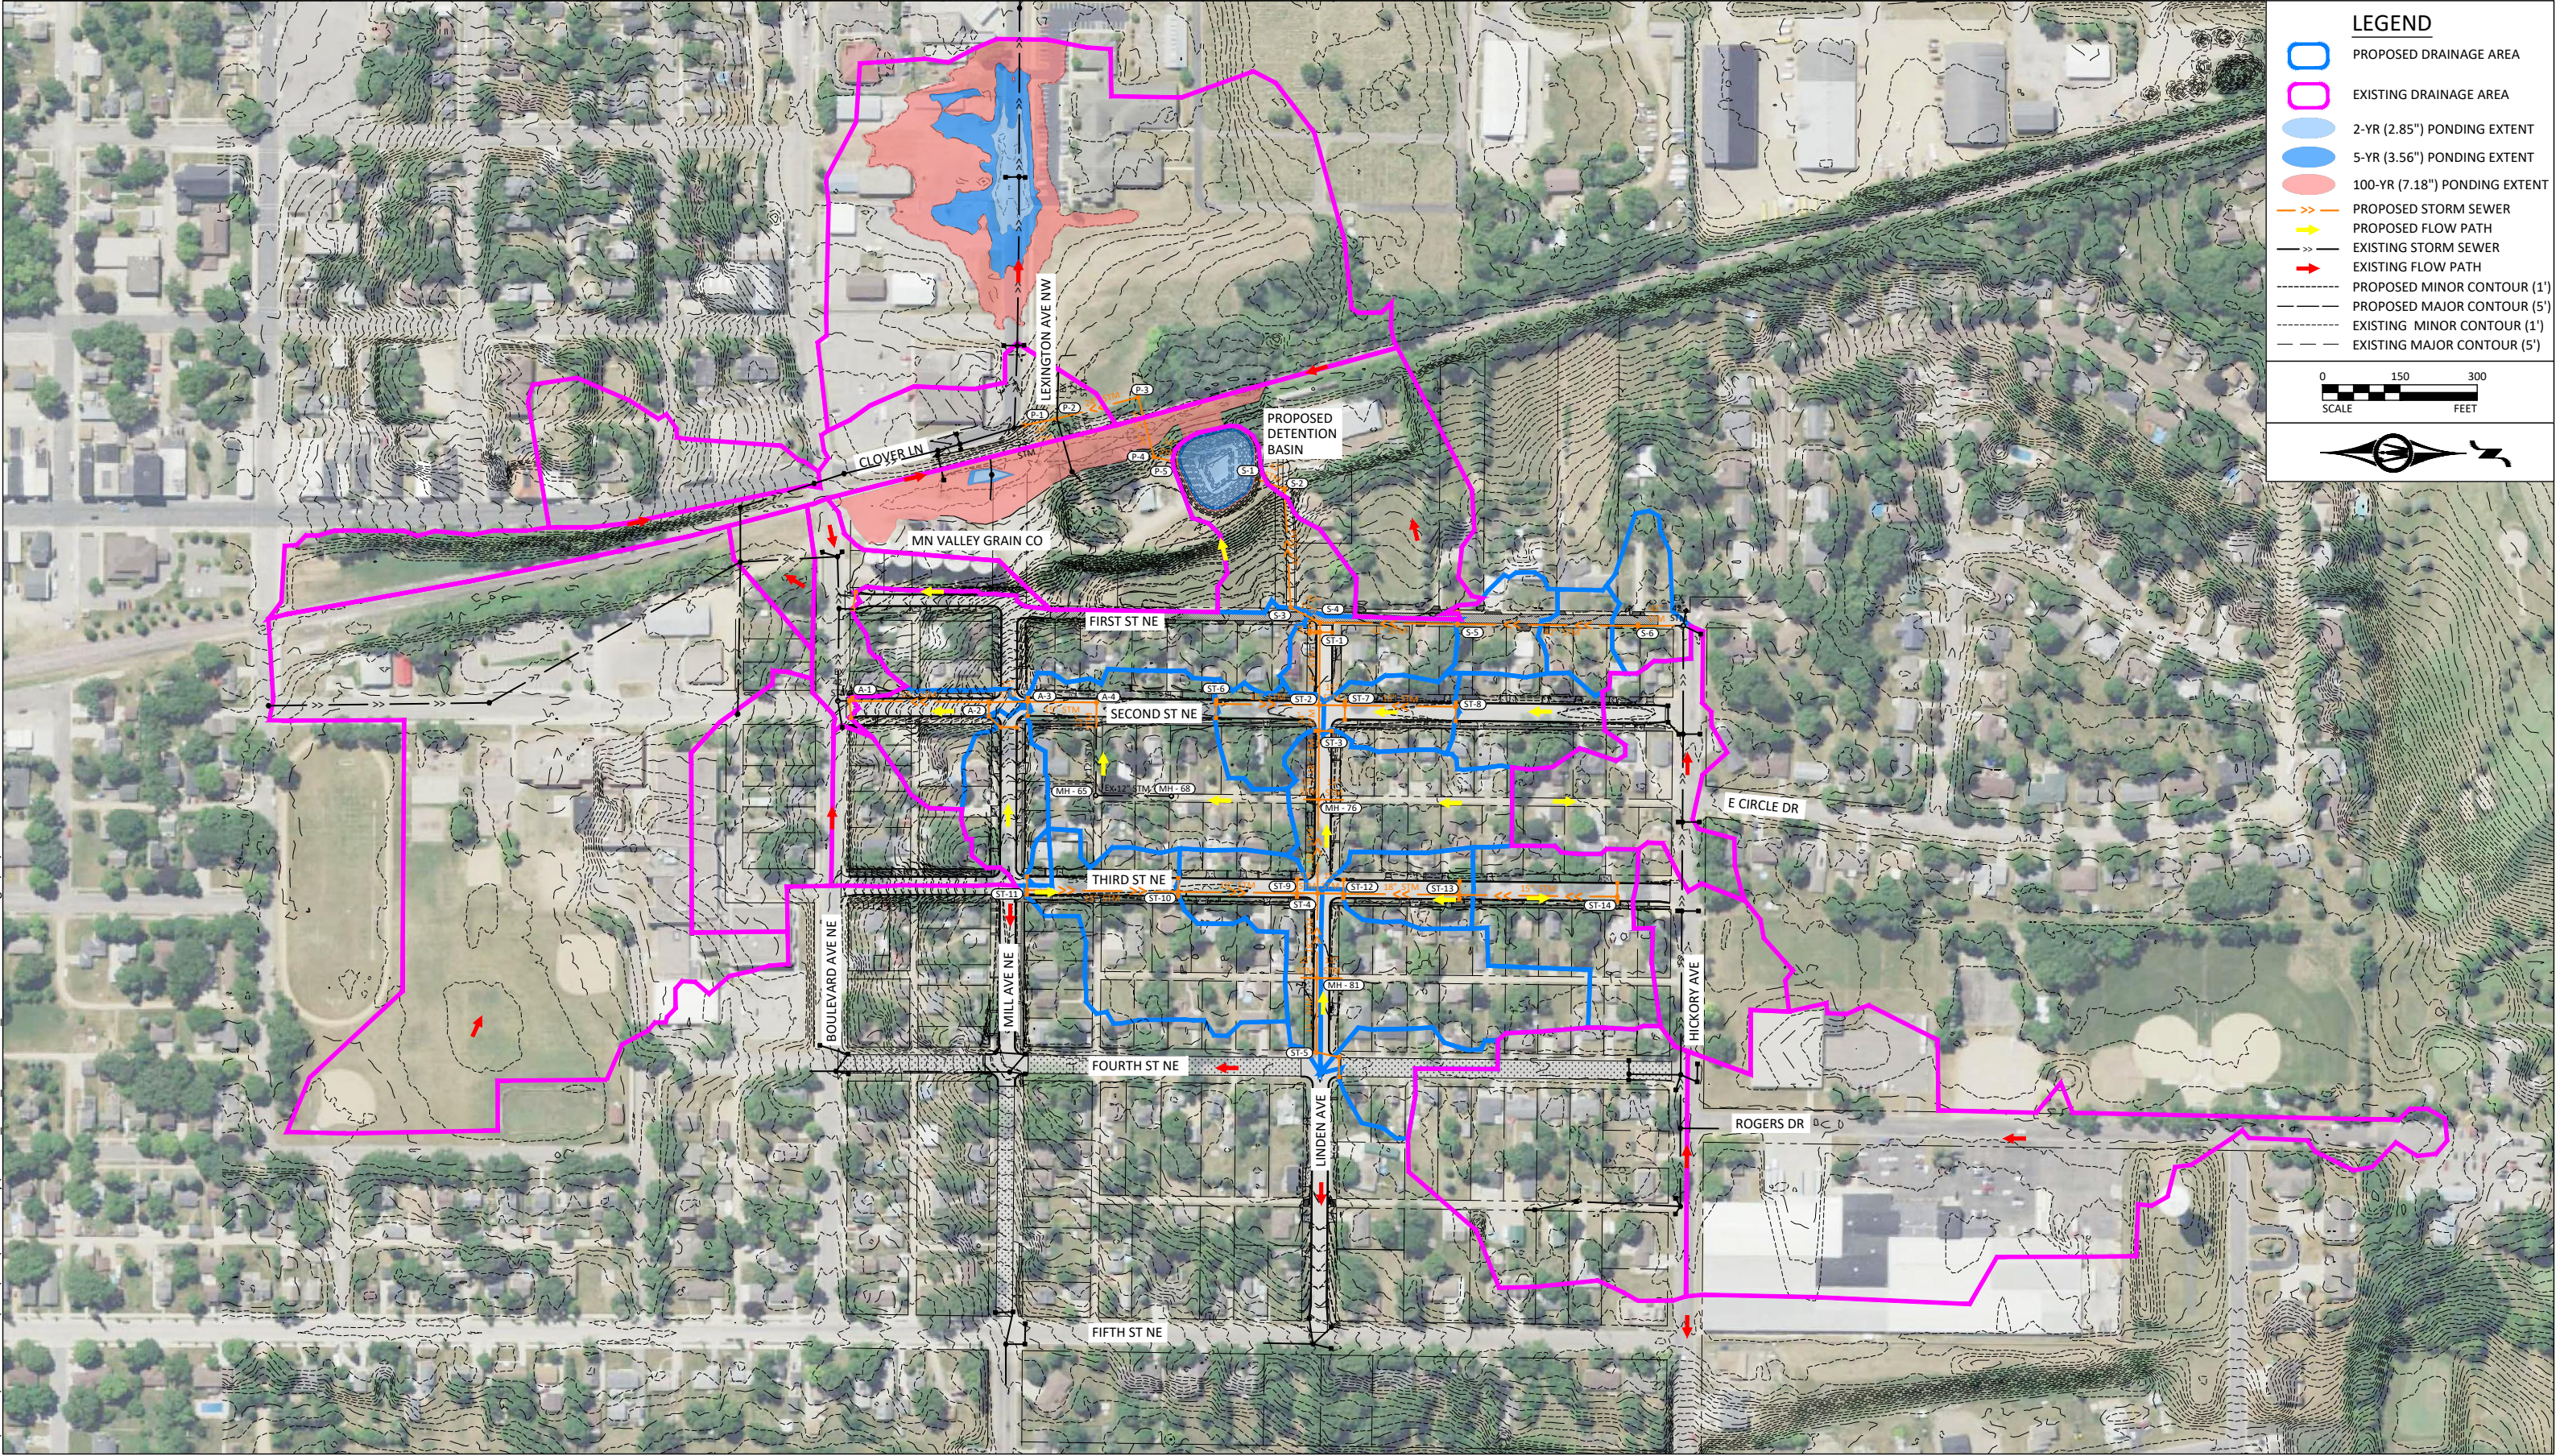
Proposed Drainage Conditions can be found in Appendix A and shows the proposed storm sewer layout and sizing, drainage areas, flow directions and ponding extents at the low point on Lexington Avenue and the MN Valley Grain Co site.
